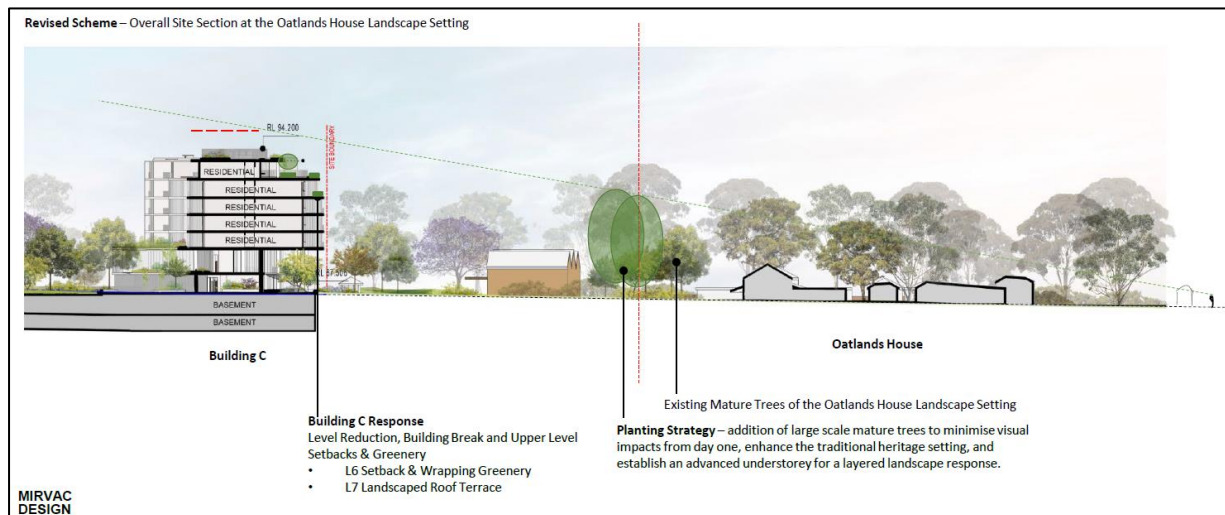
Elevation showing Buildings C scale next to Oatlands House, Supplementary Architectural Design Report, Mirvac Design, June 2023)
